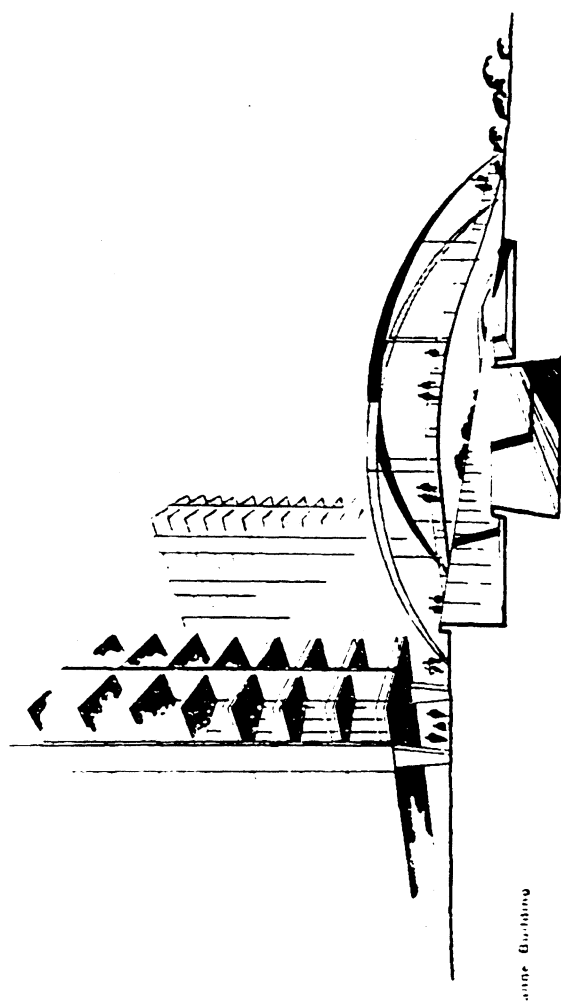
Jackson Shotwell Armstrong, 1944 proposal.
